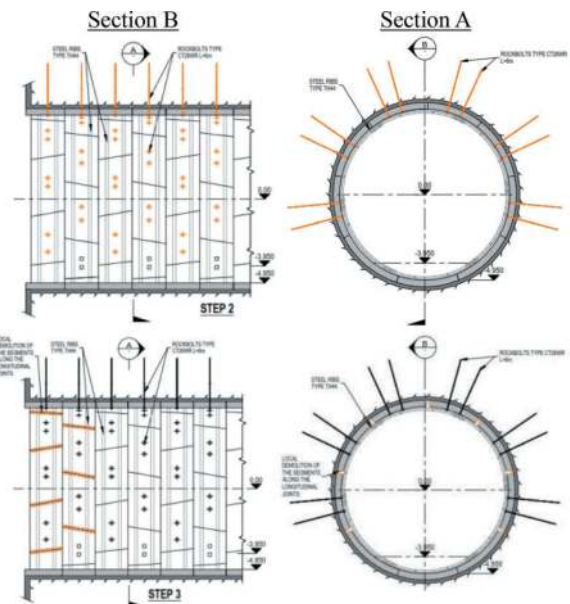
Concrete segment stabilisation with rockbolts (STEP 2) and ring stress release by local demolition along longitudinal joints (STEP 3).
